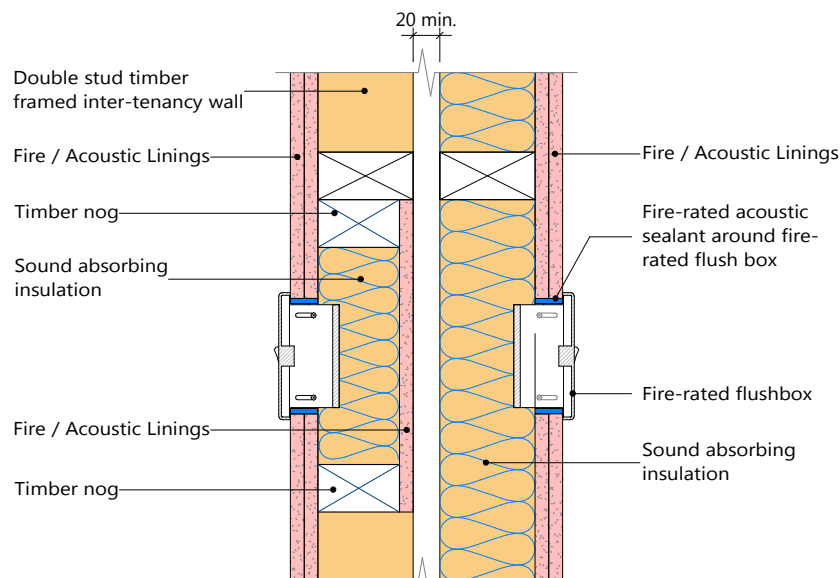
Examples of flush box penetrations through intertenancy walls and linings.
